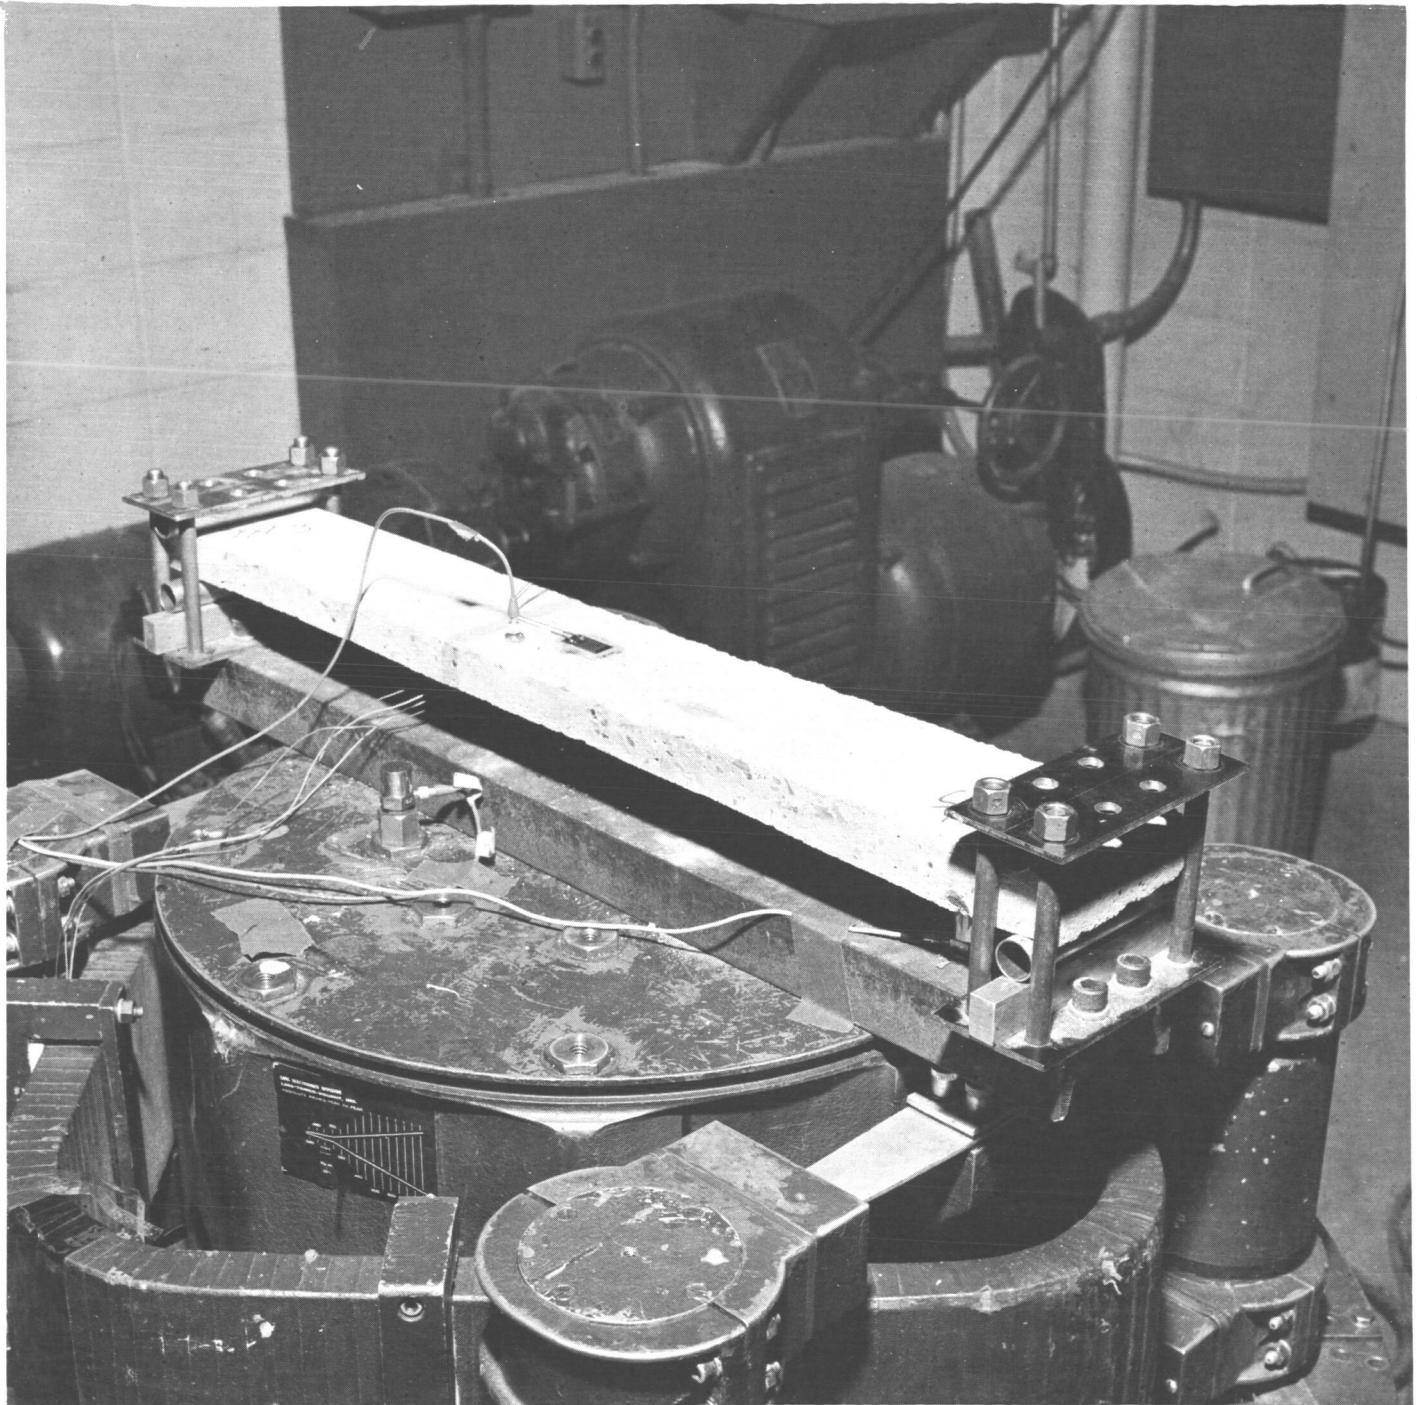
Dynamic Testing of a Concrete Beam Mounted on a M B C-25 HH Vibrator. Note the positions of strain gage and accelerometers.
